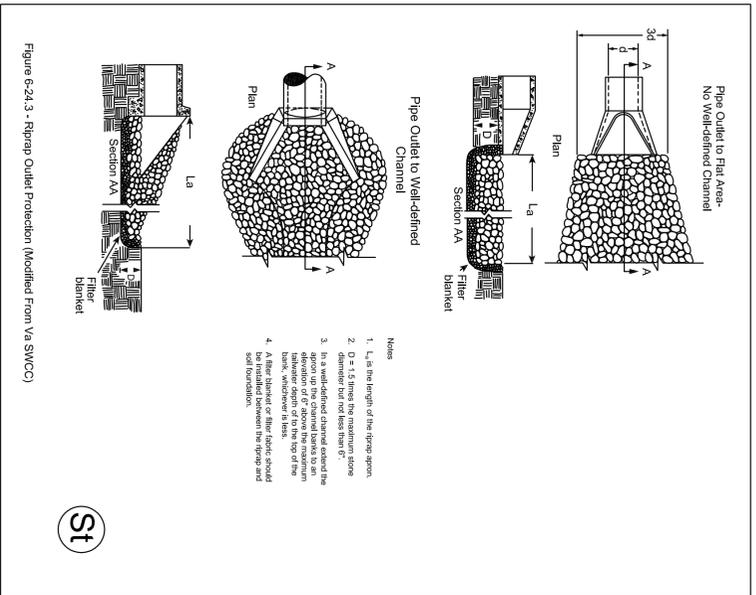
Riprap Outlet Protection (Modified From Va SWCC)
